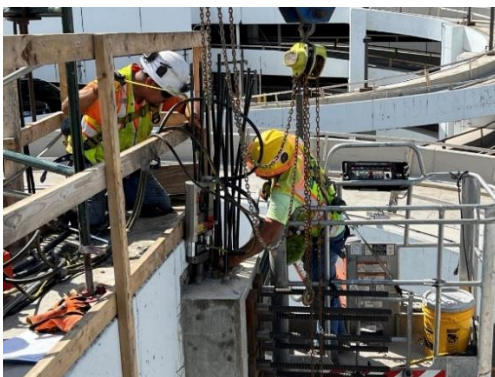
Stressing of the vertical external post-tensioning tendons strengthening the cantilevered column
